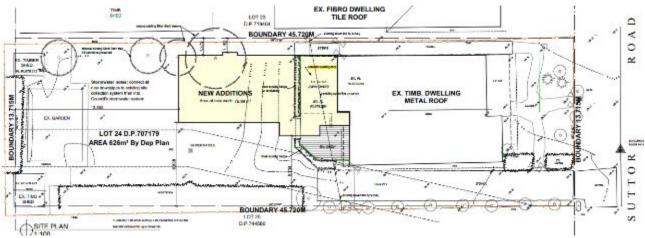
Proposed site plan, proposed additions shown in yellow. Source: Coble Stephens Architects, 14.08.2024.
